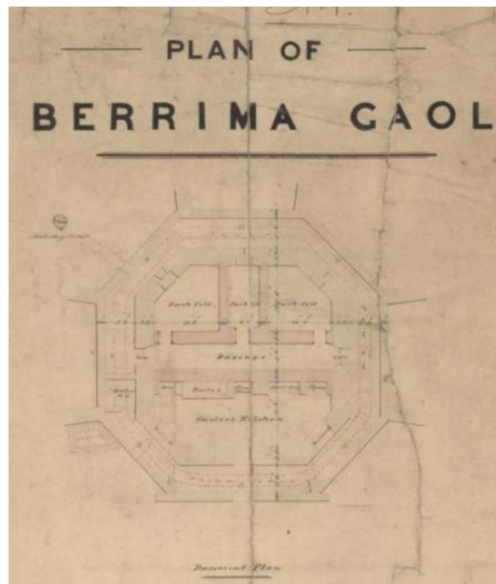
Plan of Berrima Gaol containing colonial Architects Stamp 18876 Source: NSW Plan Services, PC47/24, Berrima Correctional Centre – Site Plan
